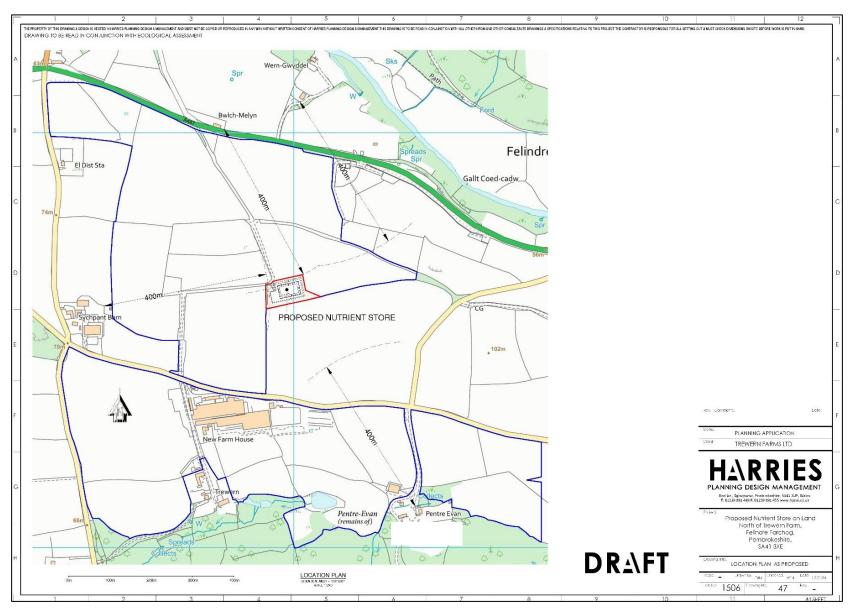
Draft location plan of proposed nutrient store (Plan provided by client).
